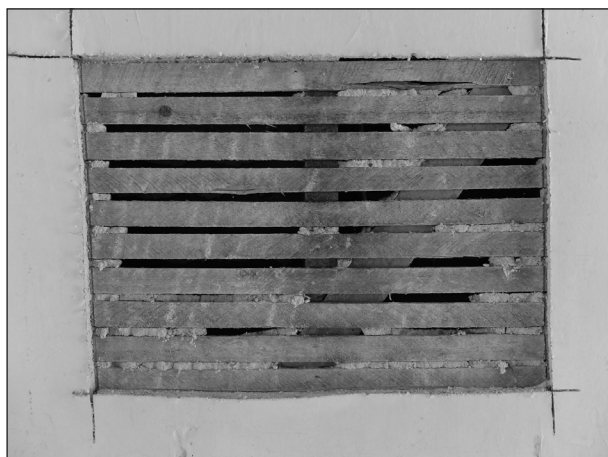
A detail of the lath and plaster lining in the hallway after the plaster was cut through and pulled away.
